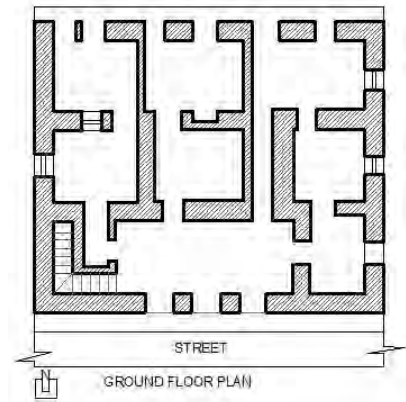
Plan of Building no-45, Source: Dept. of Archeology
